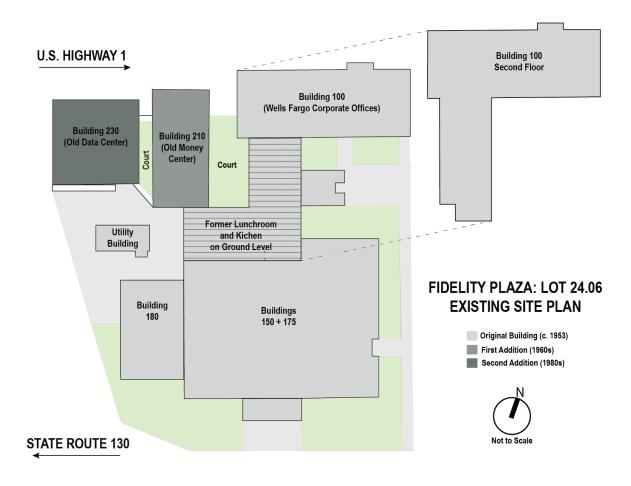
Site Plan of Existing Buildings on Lot 24.06.
